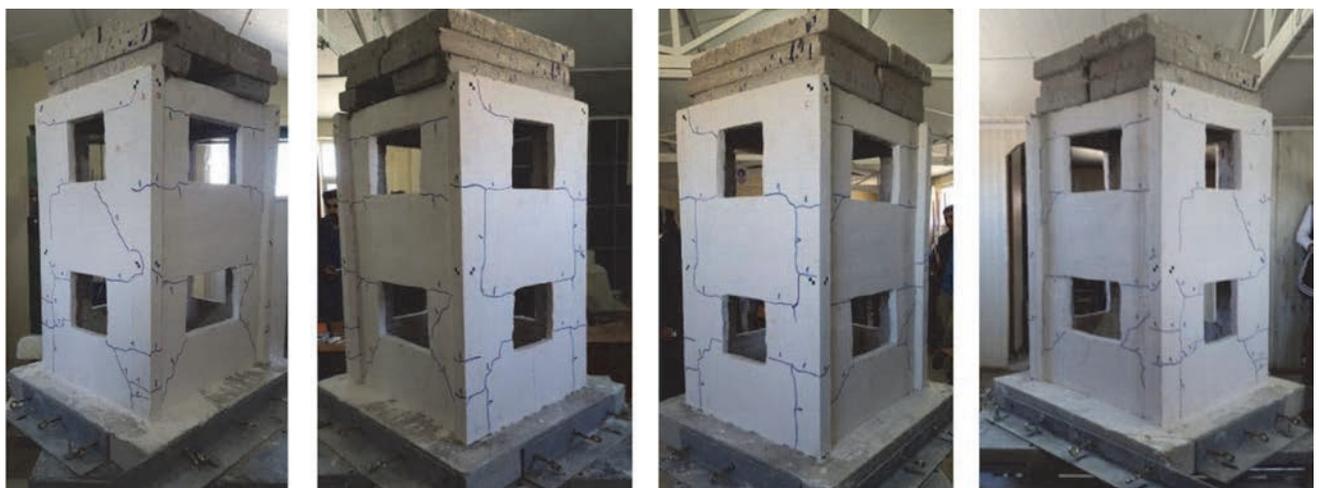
Failure mode for Specimen 3 (45°) at 1st ground motion stage
